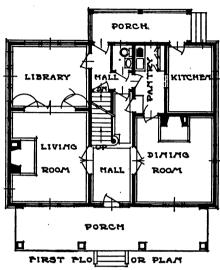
First-floor plan, house for village. See Figs. 220 and 221.
